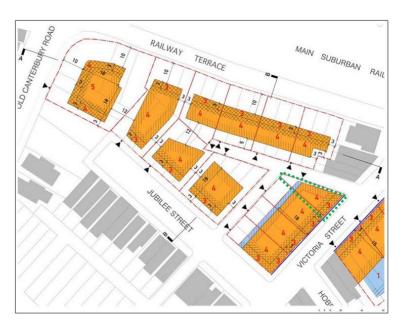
Plan Diagram (Figure 5.2b). The site is outlined in green. *Marrickville DCP 2011
